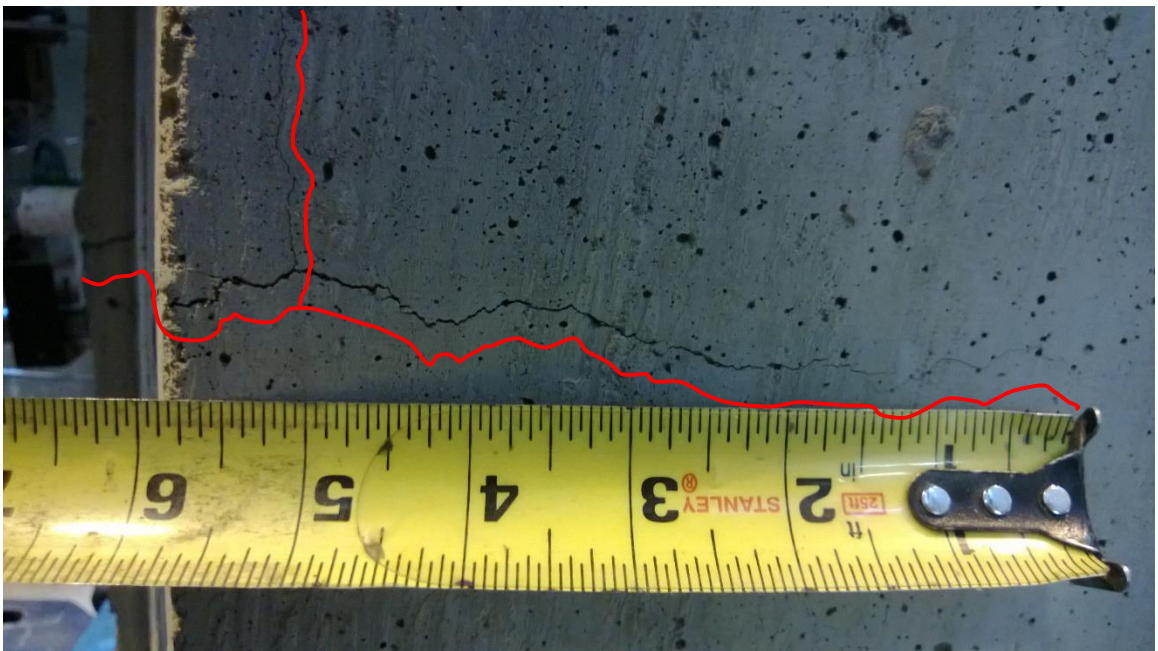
8.0M_WC_20A splitting cracks at failure on side of the flange representative of typical concrete splitting during subassemblage tests with minimum applied compressive force.
